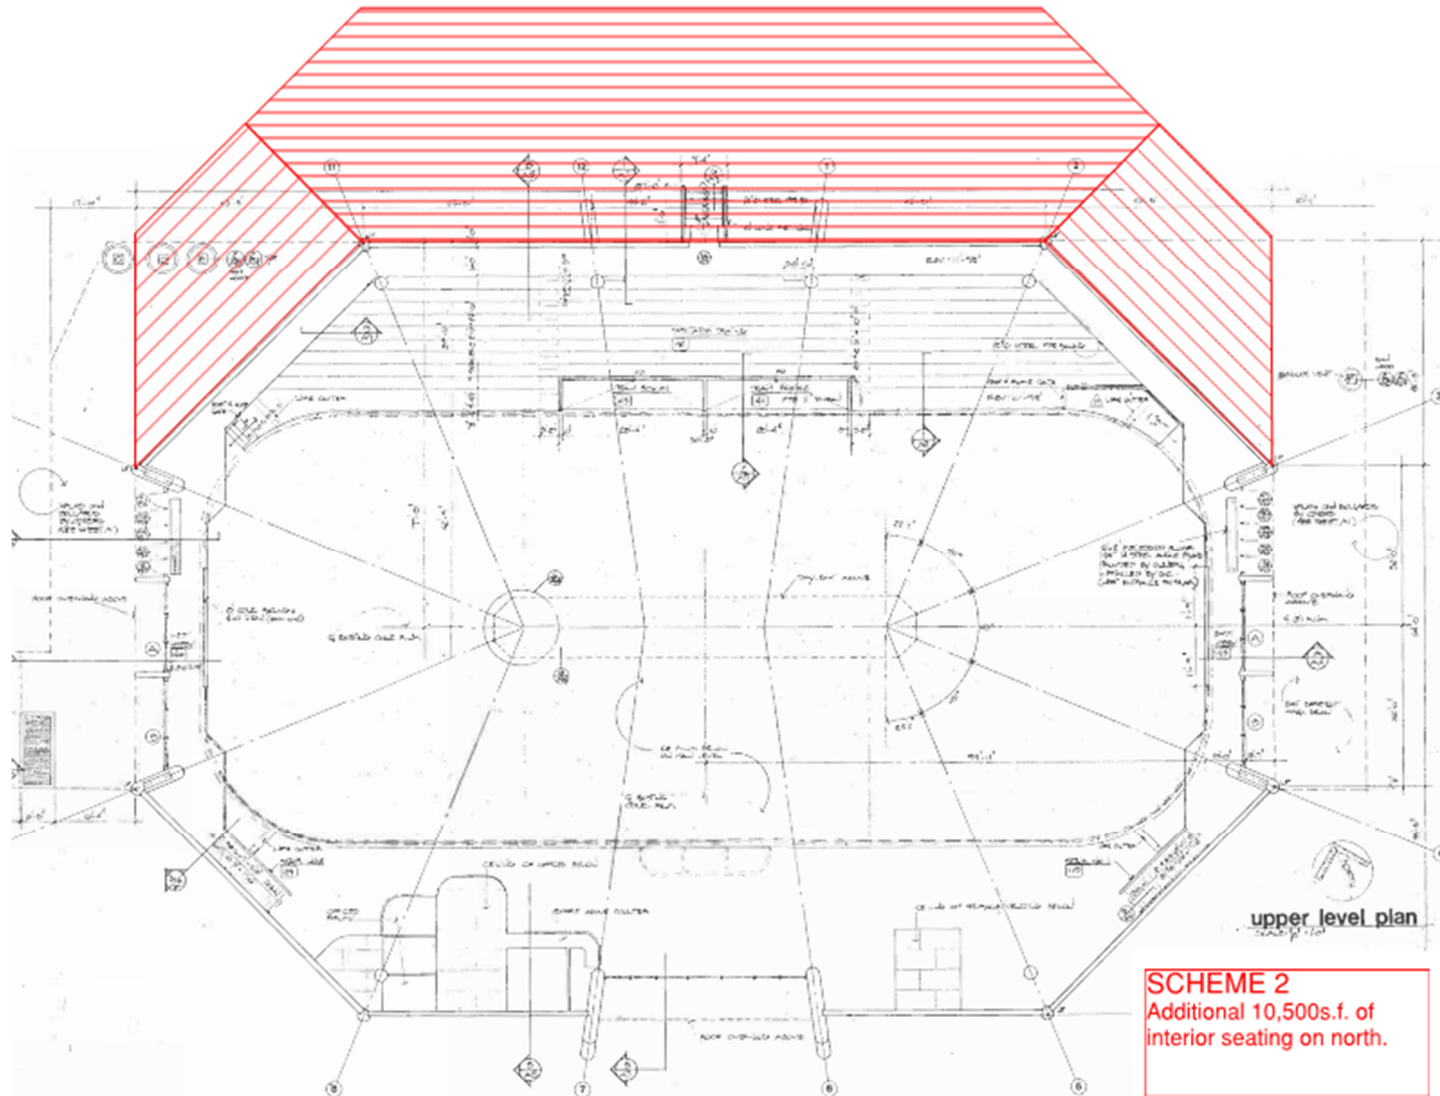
Plan showing new seating north of existing building; new roof structure required; seating from Scheme 1 could be added
